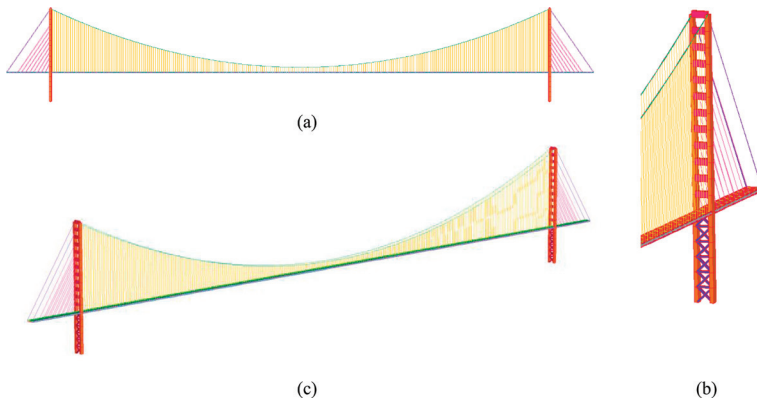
Side views and 3D view of the Strand7 model (a) Longitudinal view, (b) Details of Pylon, (c) 3D view.
